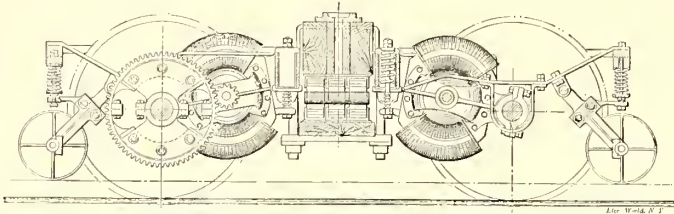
SPRAGUE SHUNT-WOUND ELEVATED RAILWAY MOTOR—1885-86
